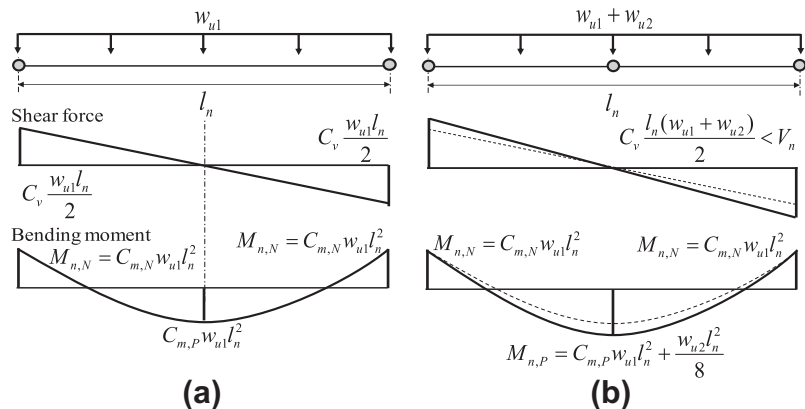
Description of failure mechanism for D-1 failure mode, (a) flexural failure at the support sections first and then and (b) flexural failure at the mid-span section.
